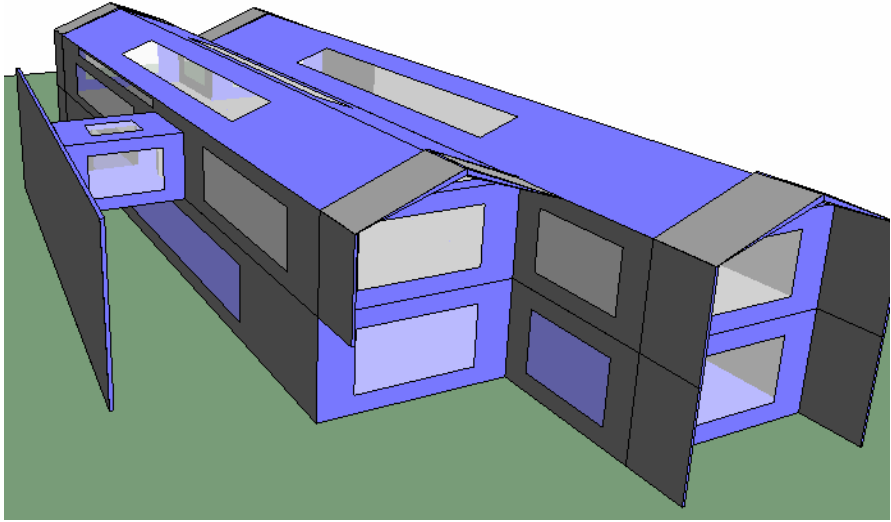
Building envelopes with glazing, 20% Roof Areas as Roof Light and 40% of Façade Areas
